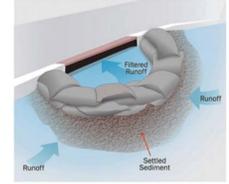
Illustration of a storm drain inlet with rock-filled bags filtering stormwater.
